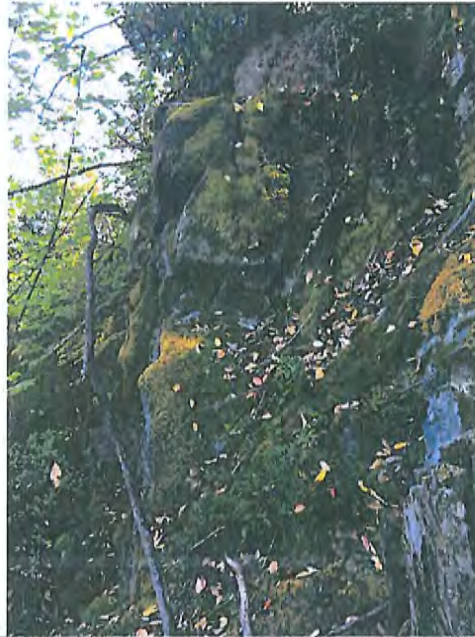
An example of the vegetated slope on the down slope side of the temporary access road at the north end of the site.
